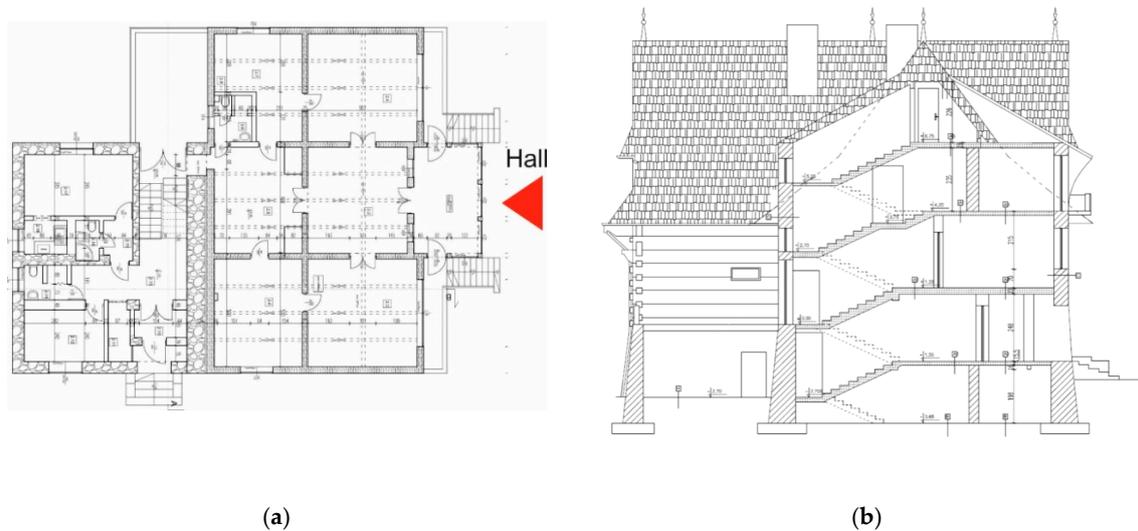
(a) Horizontal cross section of the building; and (b) cross-section of the building.
